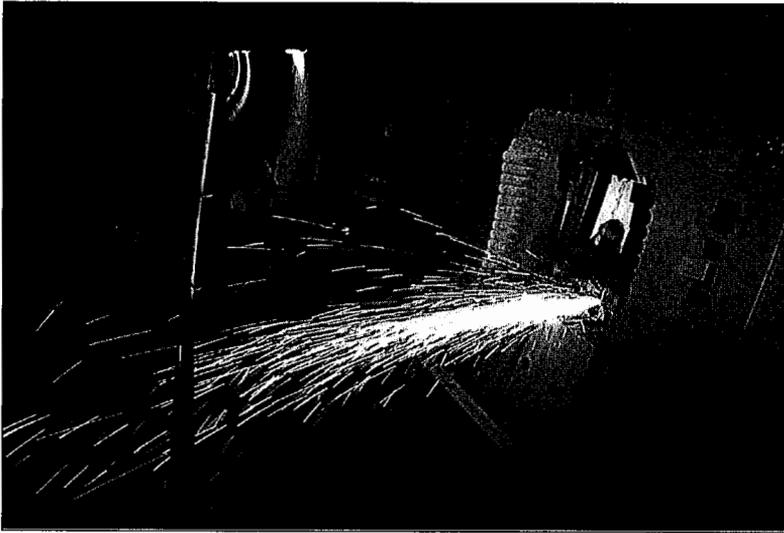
Cross-passage opening inside a Botlekspoortunnel tube.
